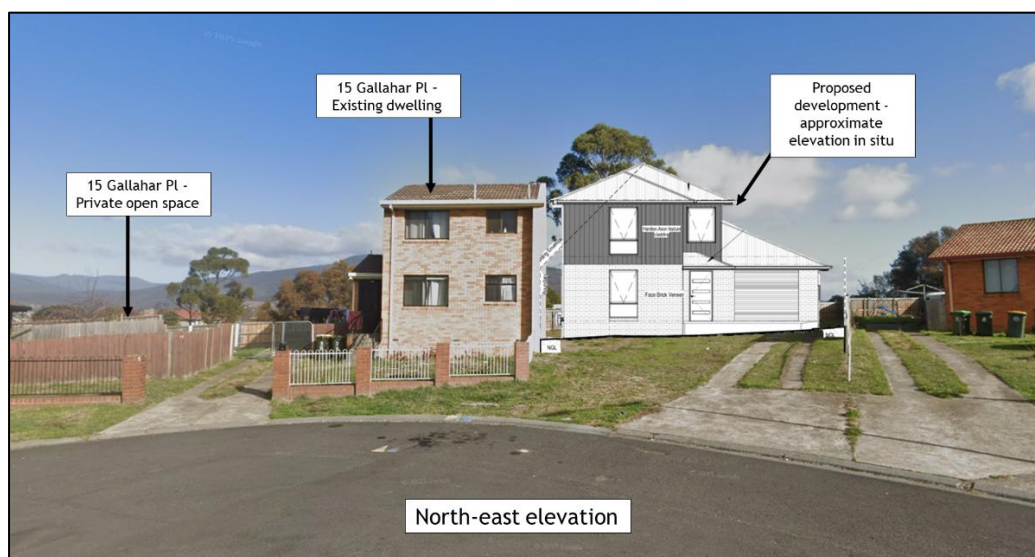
Approximate Montage Elevation in context (Source: annotated Google Streetview and proposal plans)
